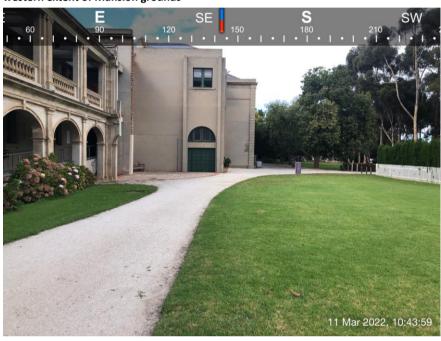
Gravel path and lawn surfaces between Werribee Mansion and ansion laundry. Location of proposed in-ground fire hydrant, inground sprinkler main, and in-ground dry fire conduit alignments
